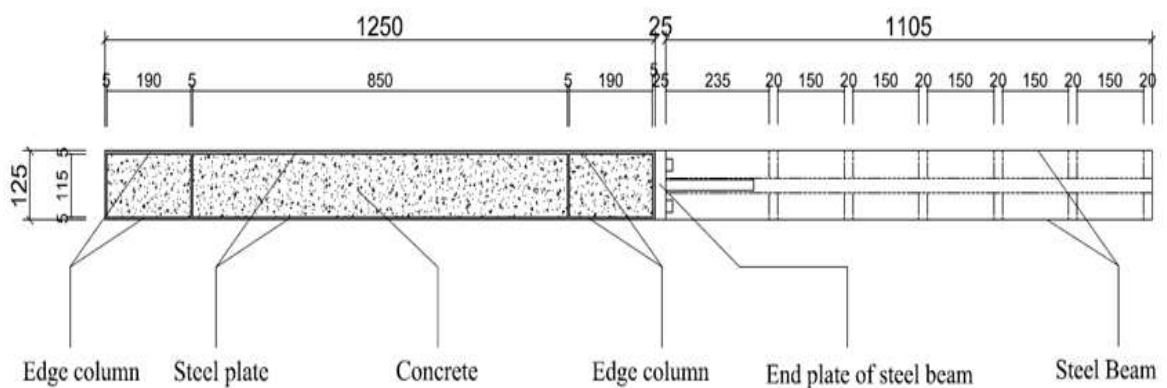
Plan View of Double-Skin Composite Shear Wall (DSCSW) highlighting the connections and dimensions of composite wall
